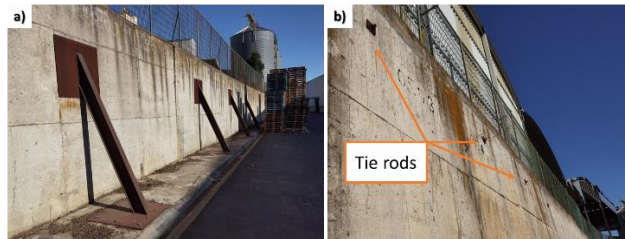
a) Steel bracing b) nailing or tie rods on the retaining wall.
